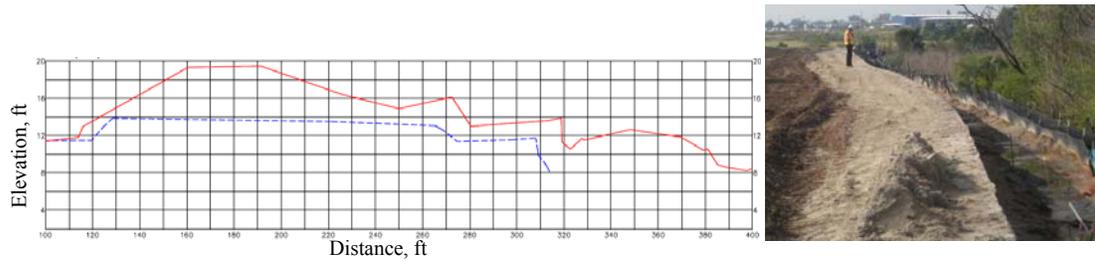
A) Surveys made approximately 1 week before failure (blue line) and 1 week after failure (red line) and B) photo illustrating the lateral displacement of the MSE wall.
